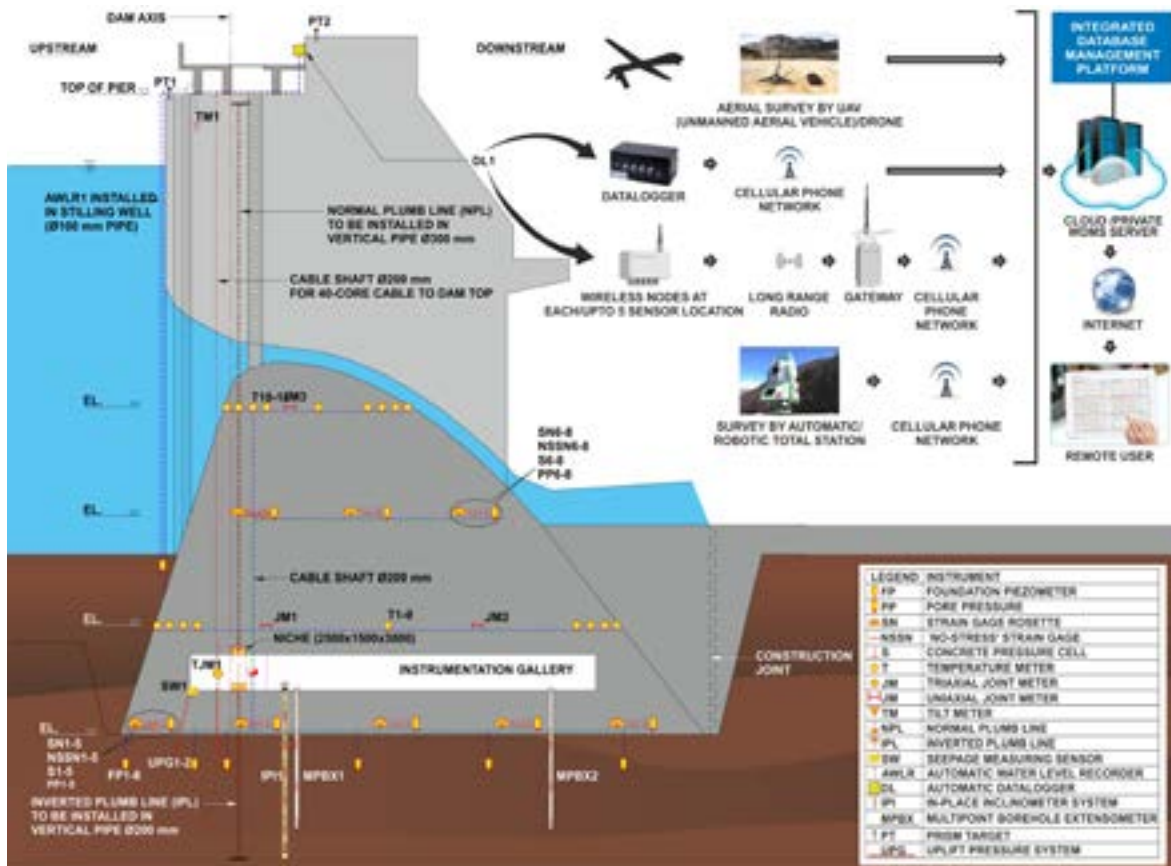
Typical instrumentation scheme of a block of concrete gravity dam
